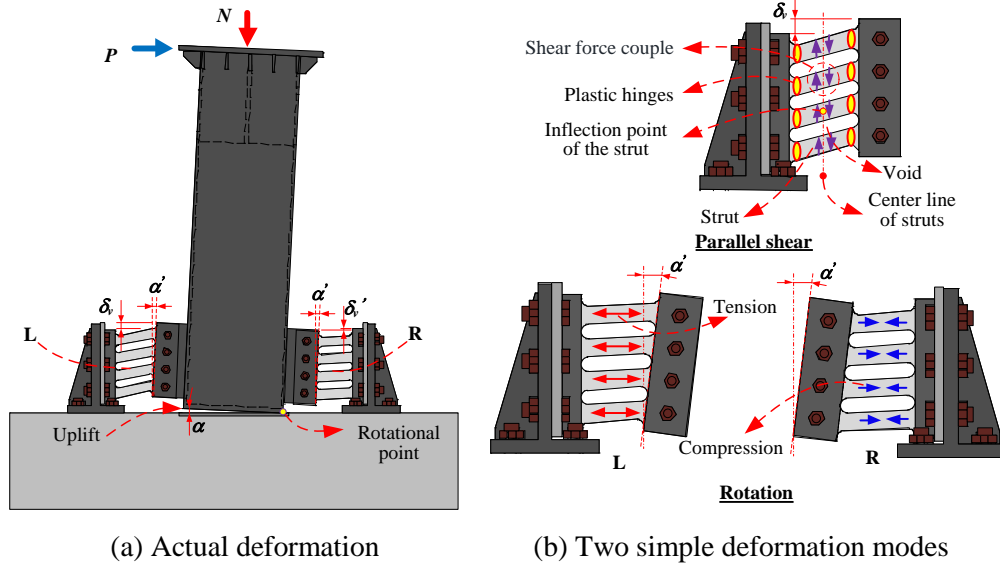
Deformation characteristics of IRR column and steel slit dampers
